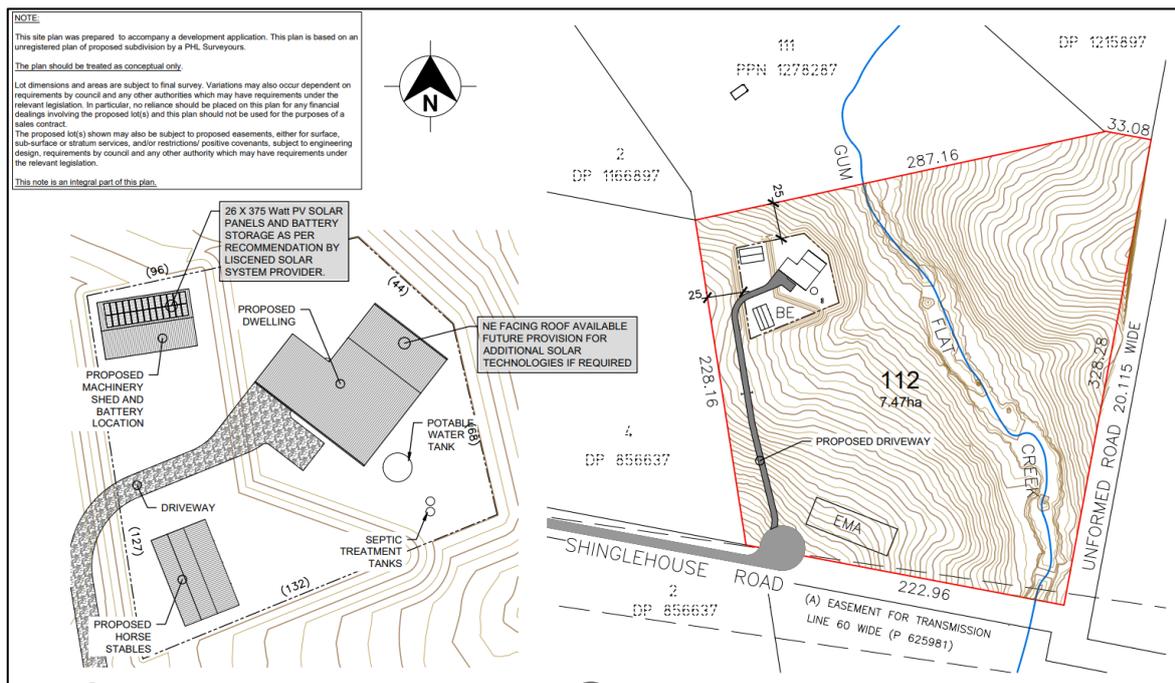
Indicative site plan for proposed Lot 112, showing proposed locations of shed, solar panels and battery
